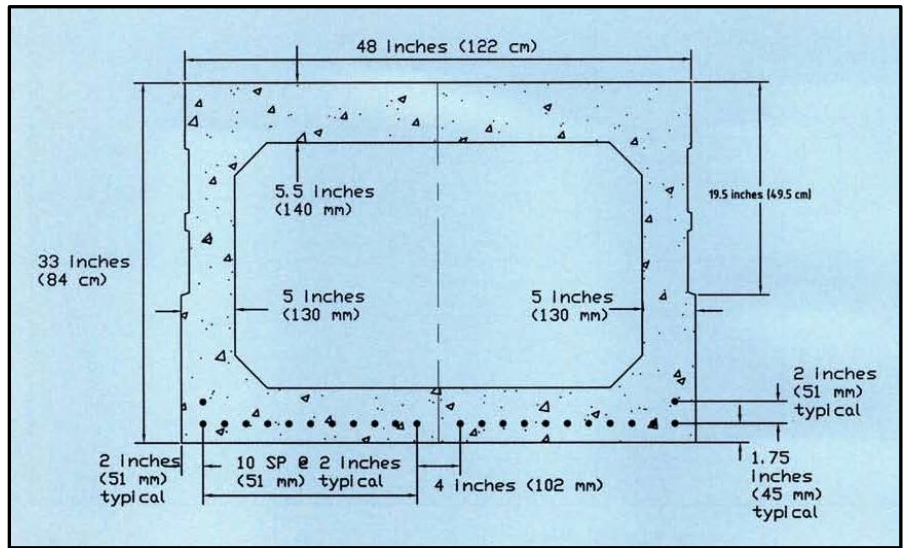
The Typical Cross Section for Tested box beams (Miller et al. 1998)
